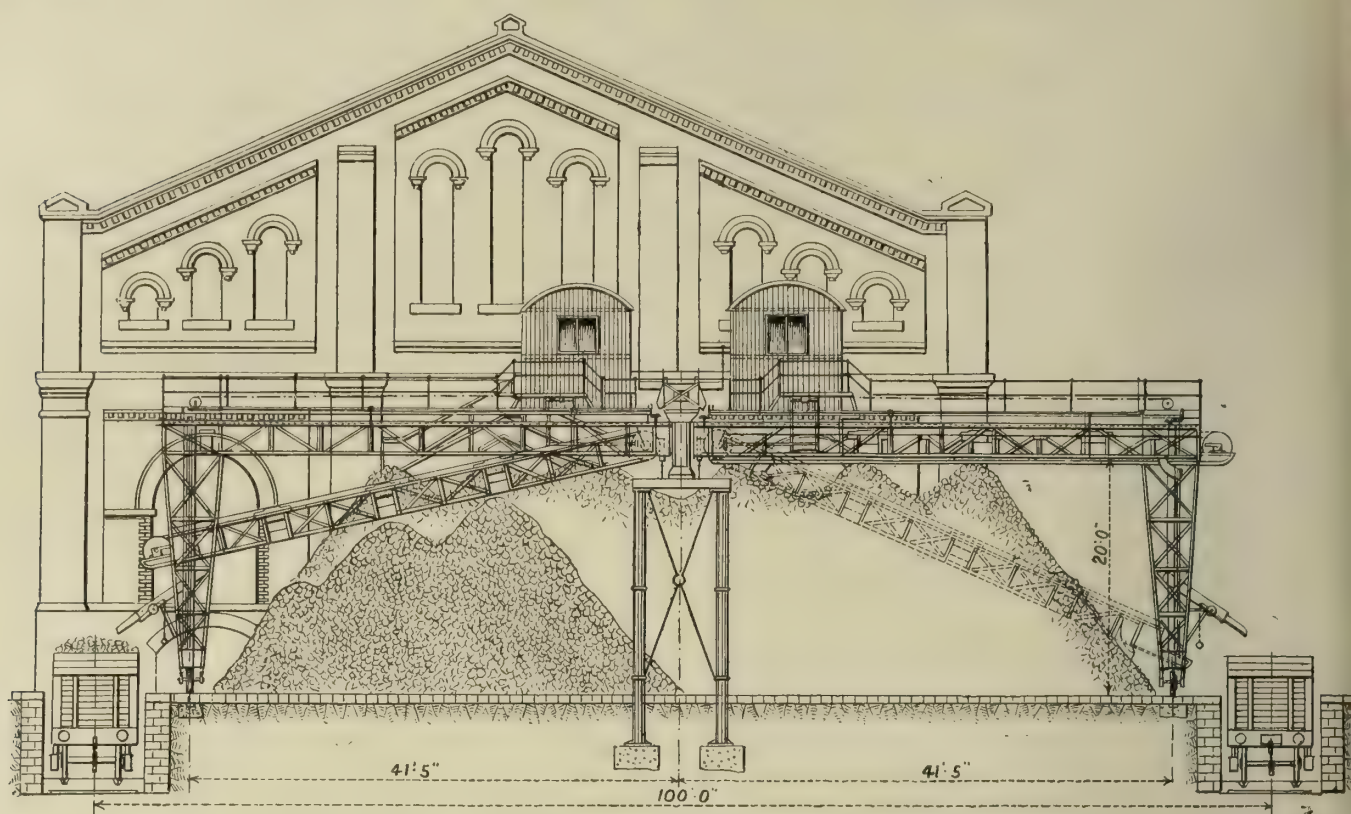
Latest Installation of De Brouwer Stoking Machinery and Coke-Handling Plant.
